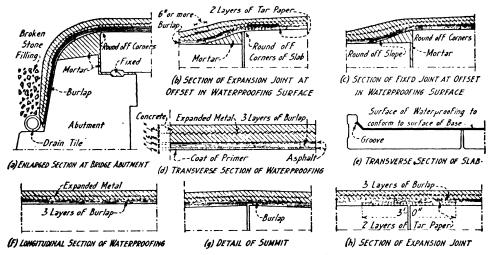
STANDARD METHOD OF WATERPROOFING BRIDGE FLOORS. C. M. & St. P. Ry.
